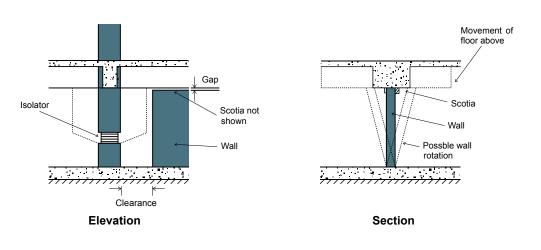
Separation of a partition wall below the isolation plane from the isolated structure above
